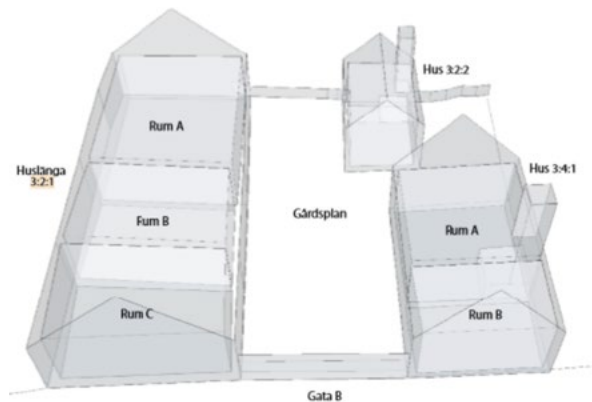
Building 3:2:1 in Nya Lödöse (Öbrink and Rosén 2017,49)
